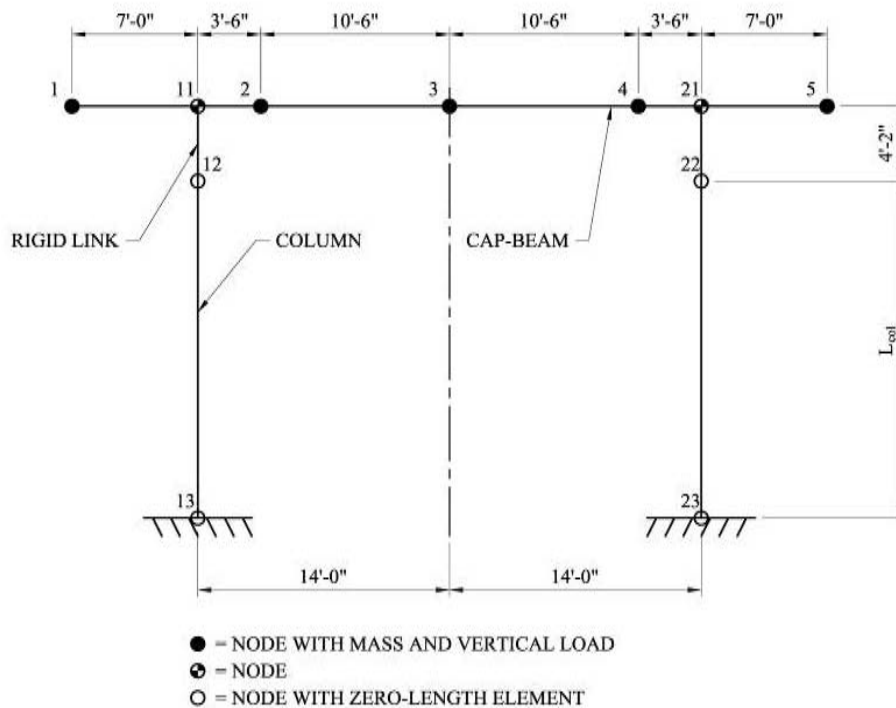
Elevation of Reinforced Concrete Baseline Frame
